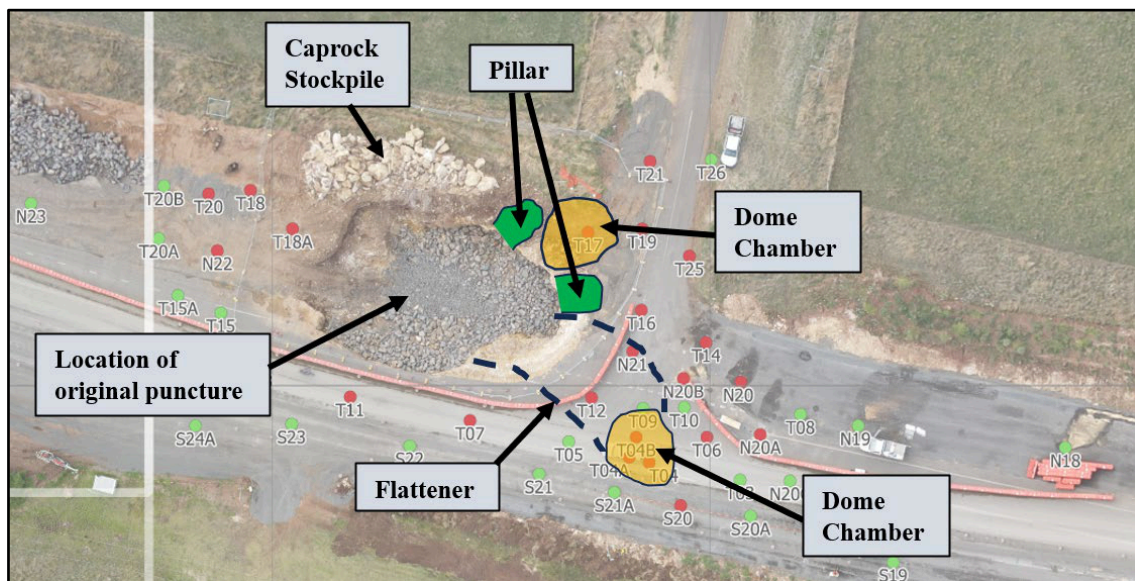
Greens Road Intersection – Main Excavation, Borehole Locations and Cave Structure Map
